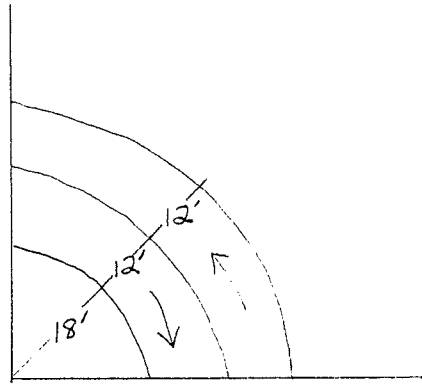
ENCROACHMENTS INTO REQUIRED PARKING SPACE
